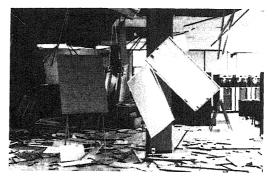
Seattle, Washington, 1965 Suspended Ceiling and Lighting Fixture Collapsed
